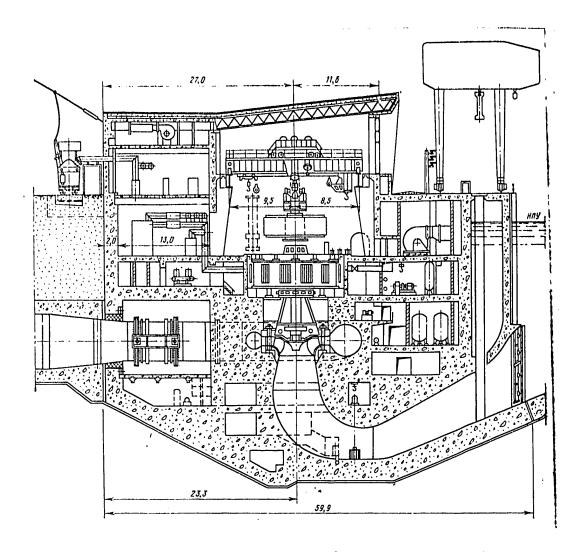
The GAES Engine House. A Cutaway View of the Hydraulic Unit.
